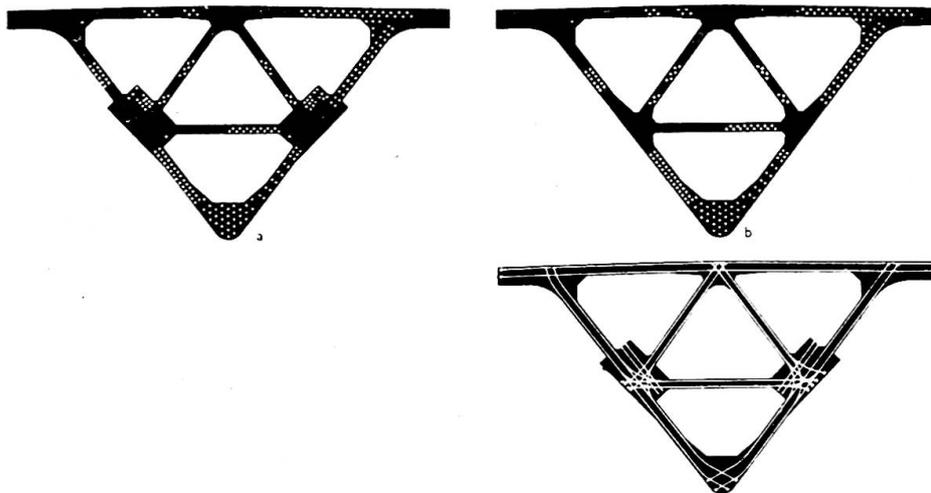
The prestressing cables (see also fig. 9.9). Longitudinal cables at place of hinge. Longitudinal cables between hinges. Transverse cables at place of hinge.
